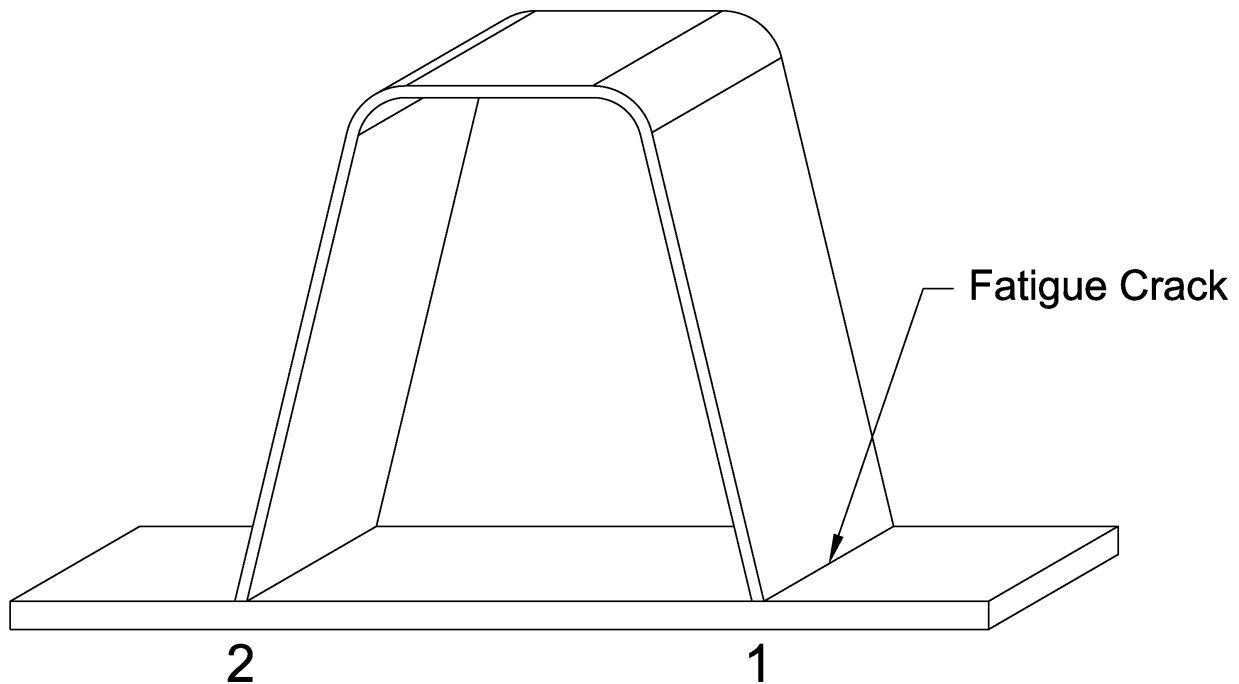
Schematic. Denotation of weld locations for laser panel specimens.
